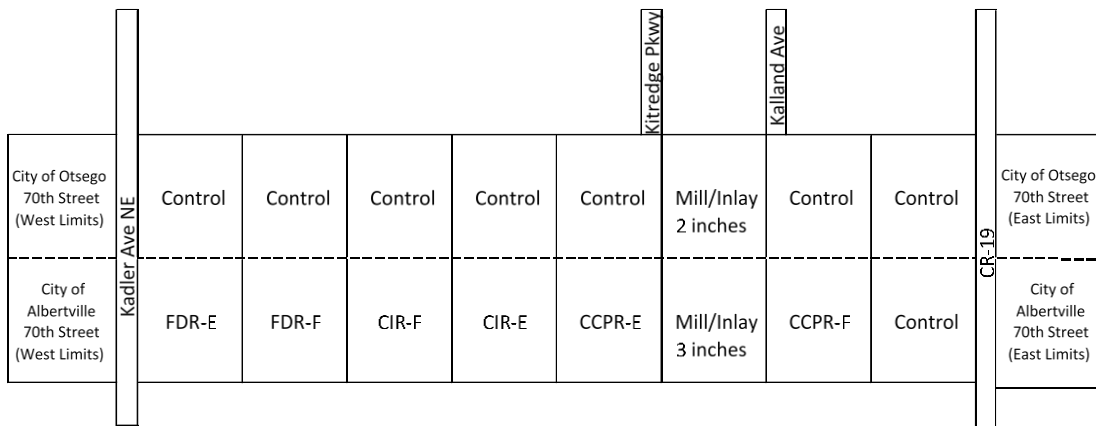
70th Street test section layout (wearing surface is a 1-inch ABR thinlay).
